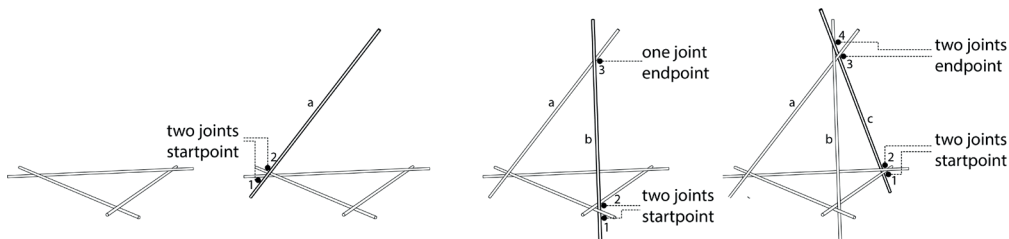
Sequential adding of three bars onto an existing structure leading to two joints, three joints and four joints.
